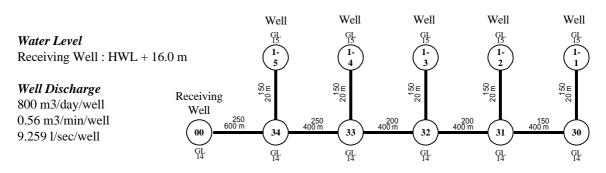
(1/2) Schematic Plan of Well Connecting Pipe : Unit 1 (Well Number 1-1 to 1-5)
